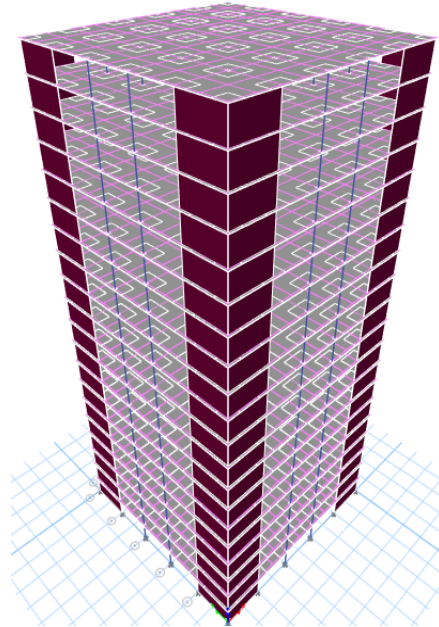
Three-dimension model of a structure with flat slab and shear wall at corner
